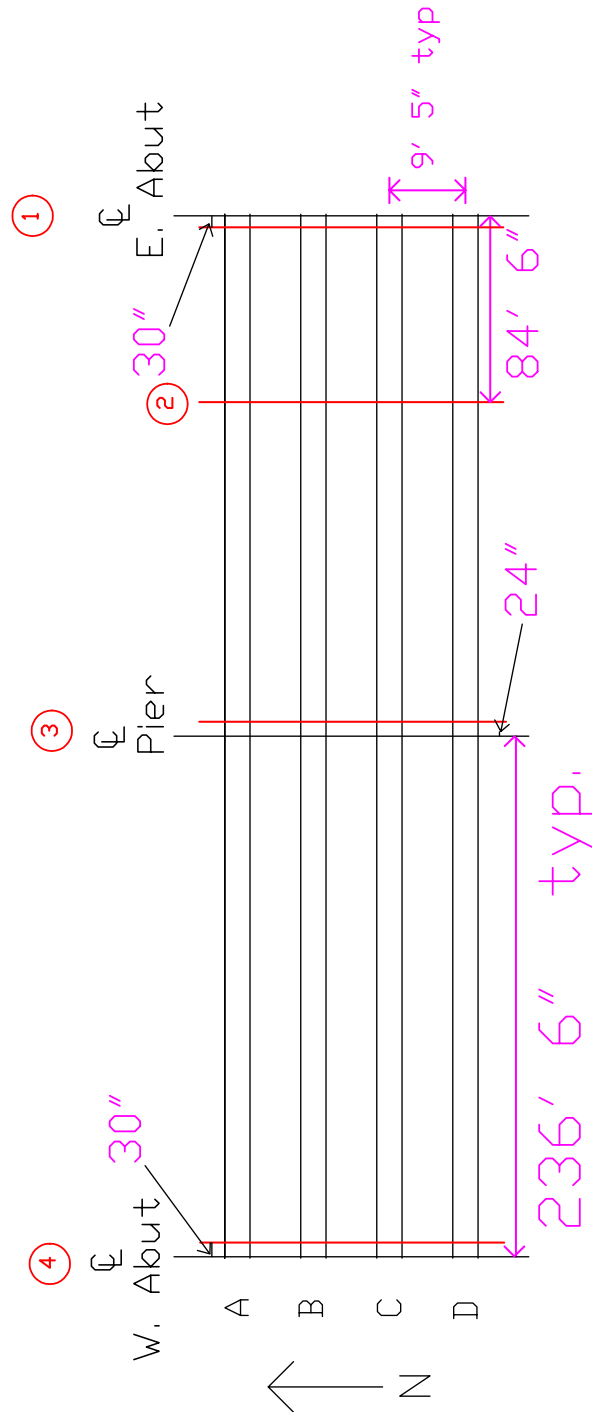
Sections for spot-weldable steel strain gages for Phase II. Sections 1 and 4 are at the abutments, section 2 is at the maximum positive moment, and section 3 is at the pier
